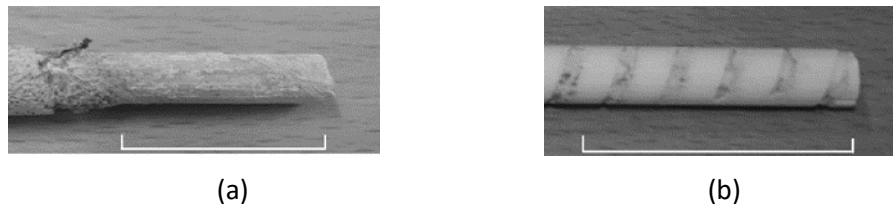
External surface of the GFRP rebars after pull-out: (a) ASLAN 100 with concrete cover 20 mm; (b) ComBAR with concrete cover 15 mm.
